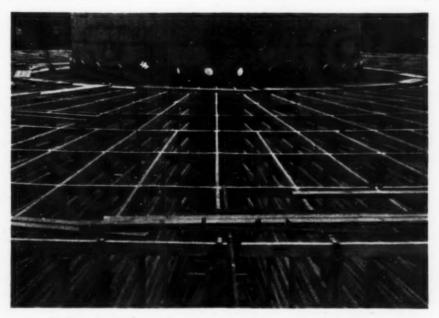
Cooling Tower: Precast Concrete Cooling Stack.
